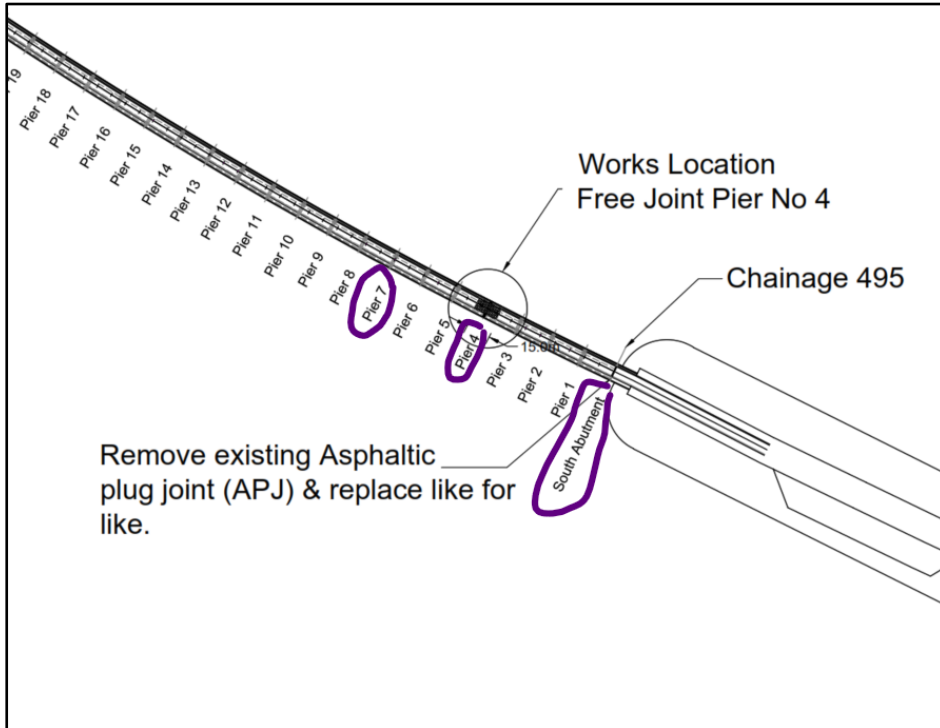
Location of the works on A9 Cromarty Bridge between the southern abutment and Pier 7.
